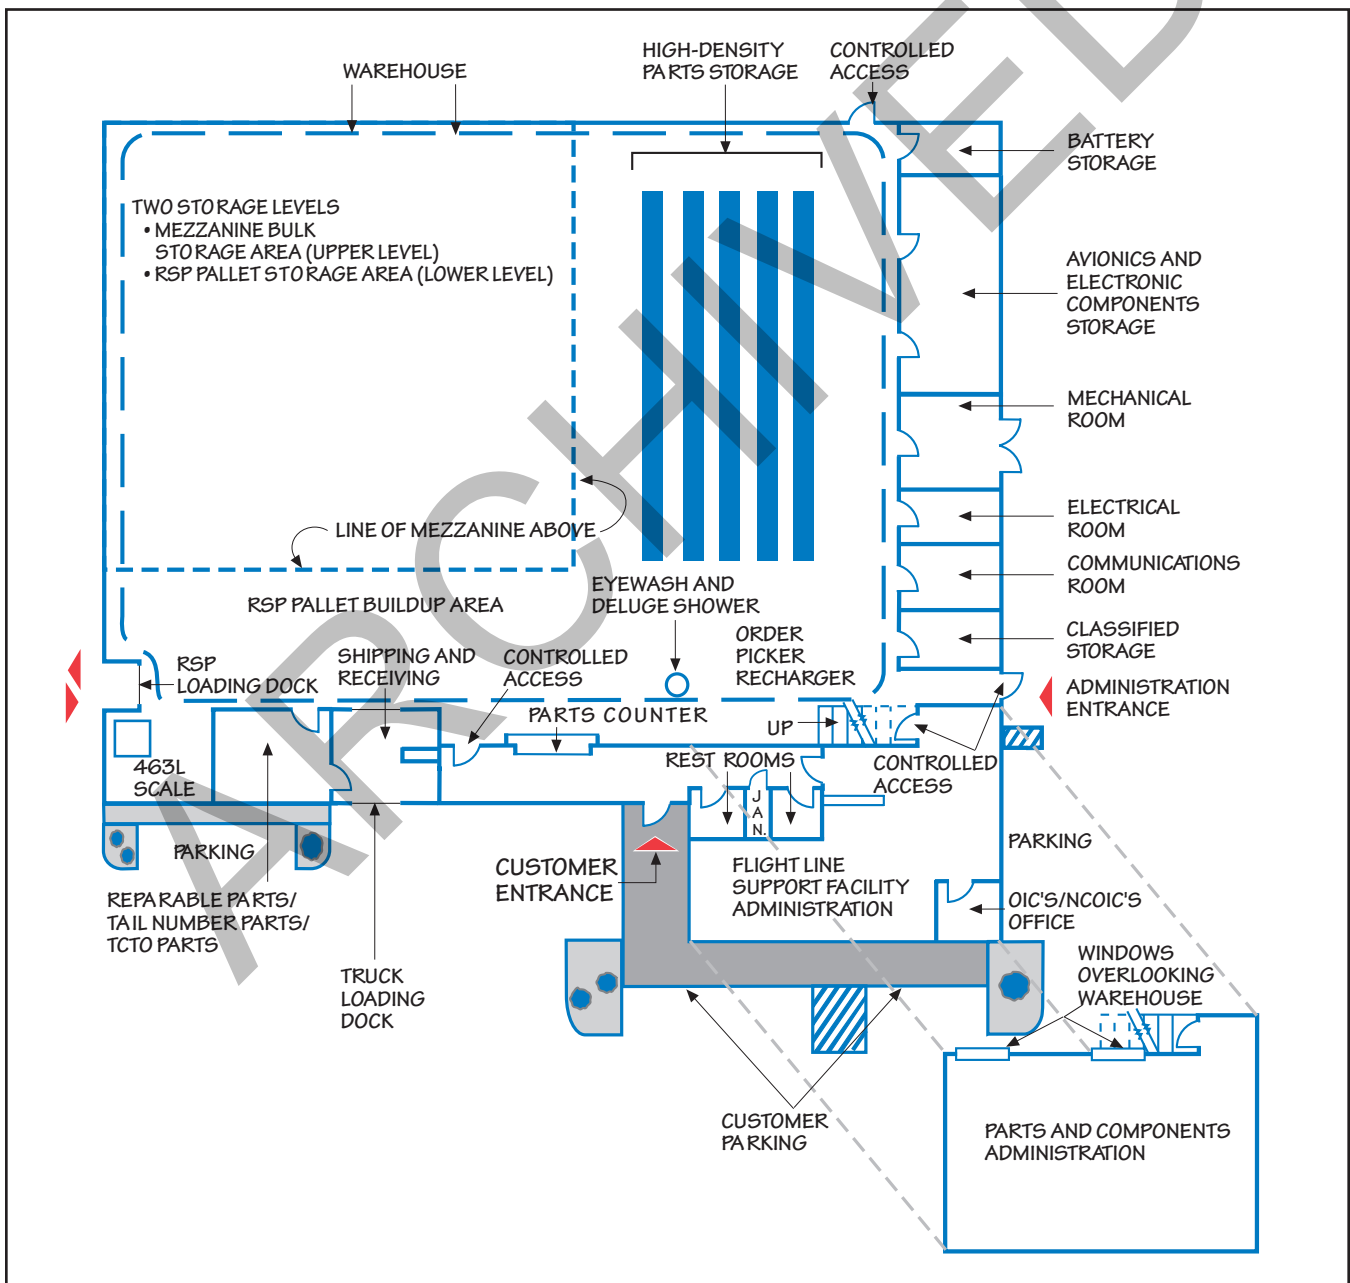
A: Floor Plan for the Typical Flight Line Support Facility.
